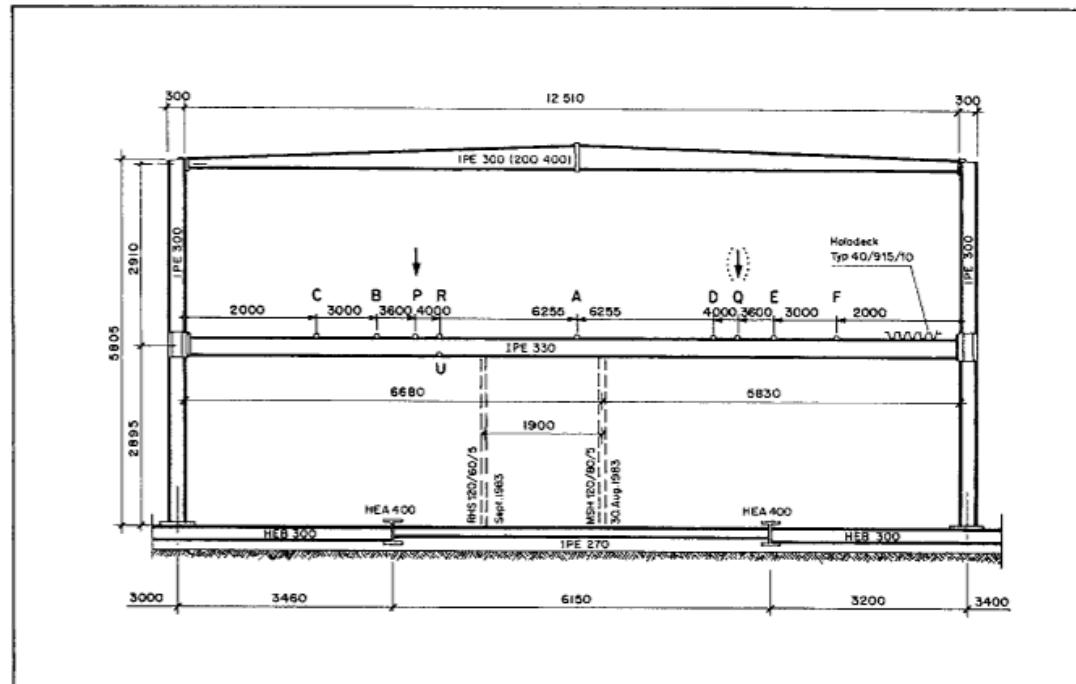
Office building (from [2.26]): Section through a typical frame, supported elastically by the steel girder grid
